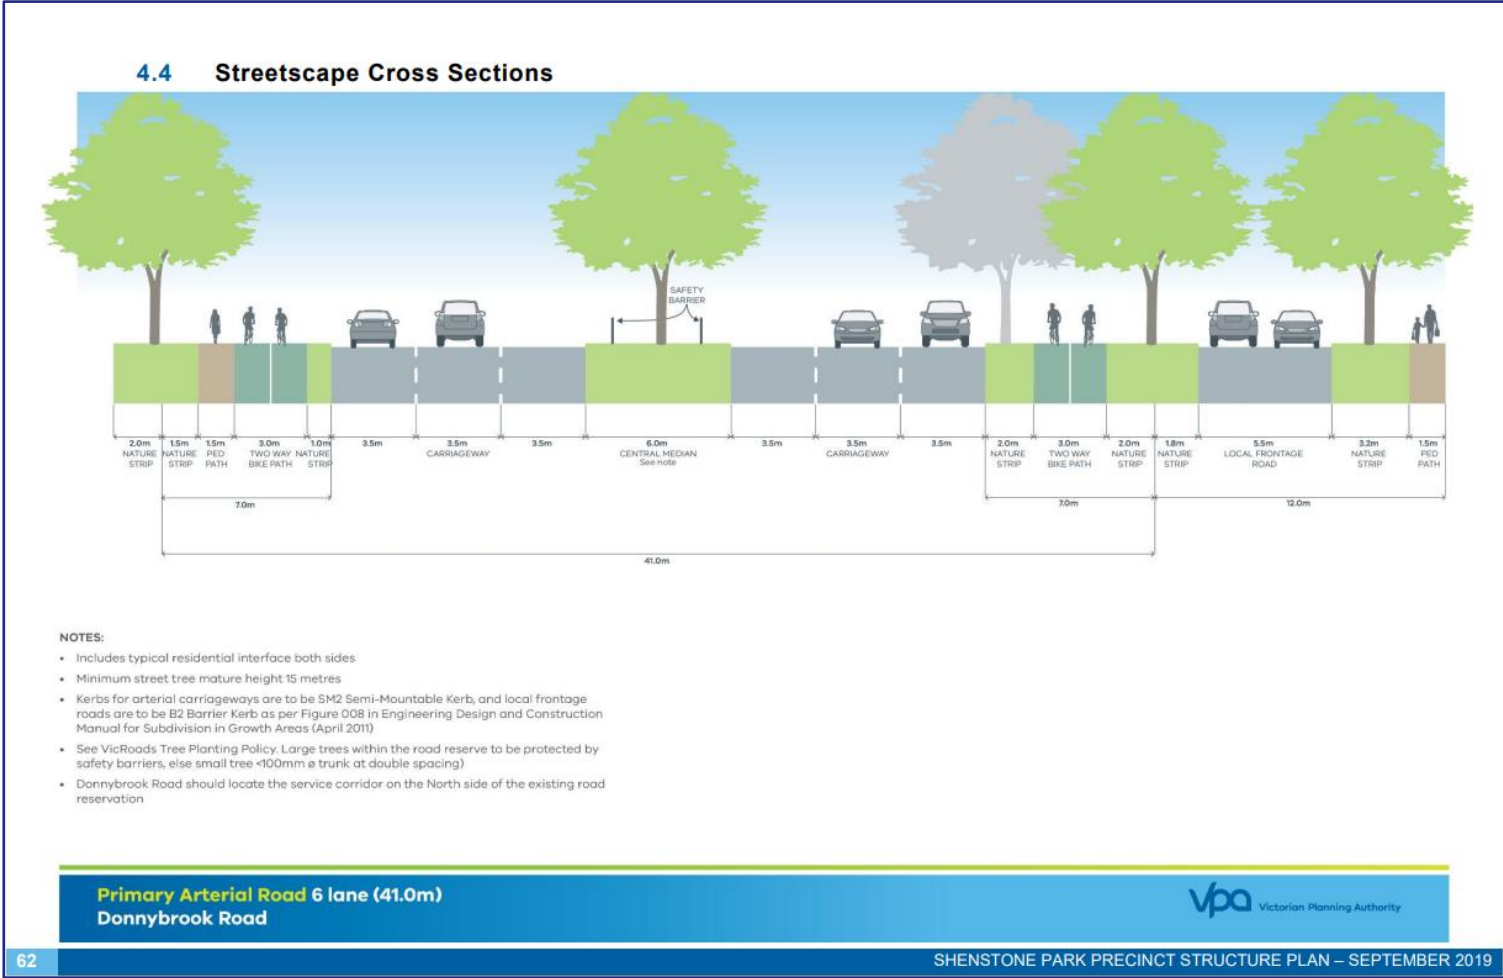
Excerpt of Primary Arterial Cross-Section from Draft Shenstone Park PSP (Exhibited)
